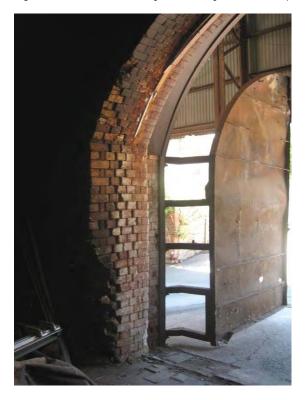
Interior of kiln showing entry and deteriorating fire bricks. (Source: Lovell Chen, 2010)
